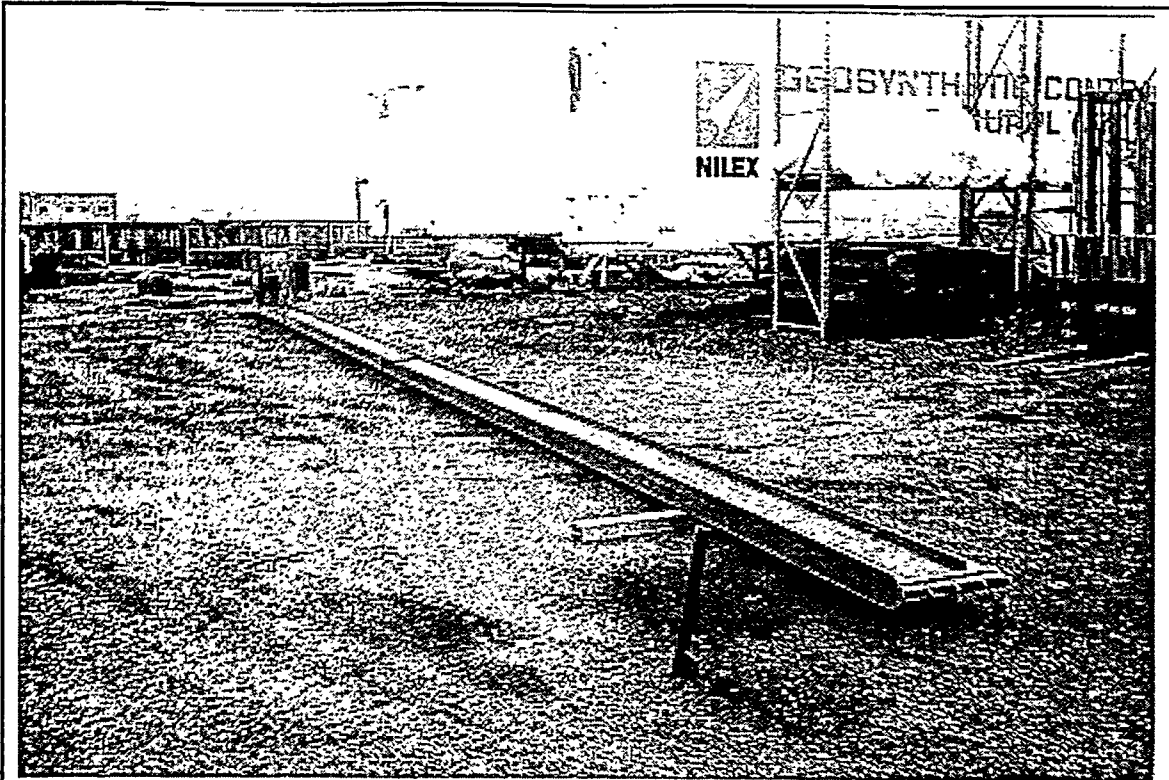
Photo Showing Overall 55-Foot Long Mandrel Constructed from Rectangular Tubing and Longitudinal Stiffening Plates (Materials Hopper at Top)
